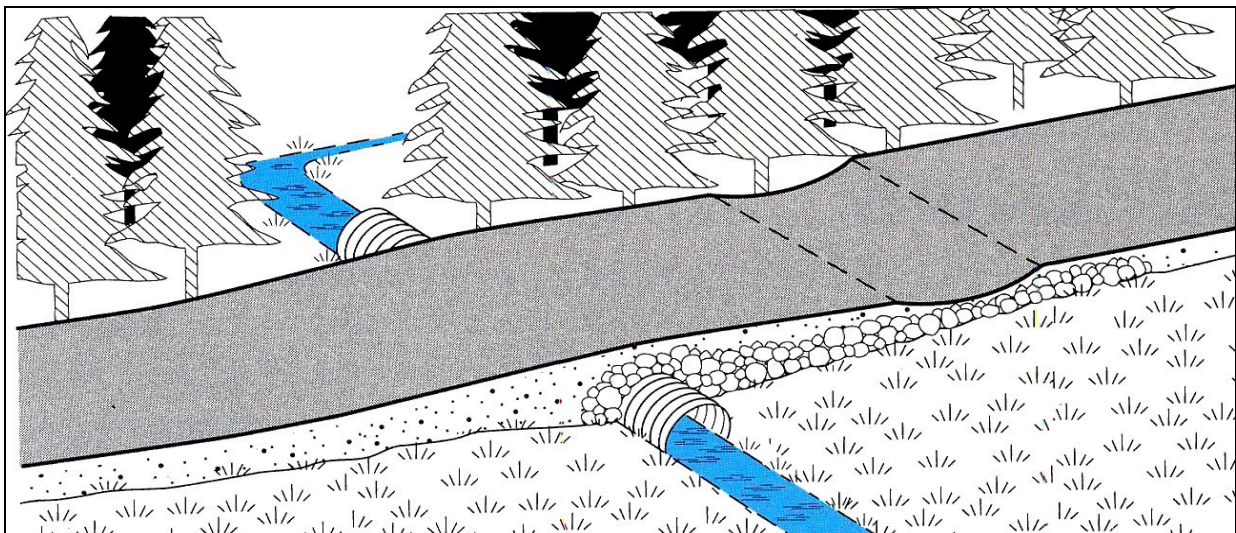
Proper Culvert Installation and Use on a Wetland Road.
